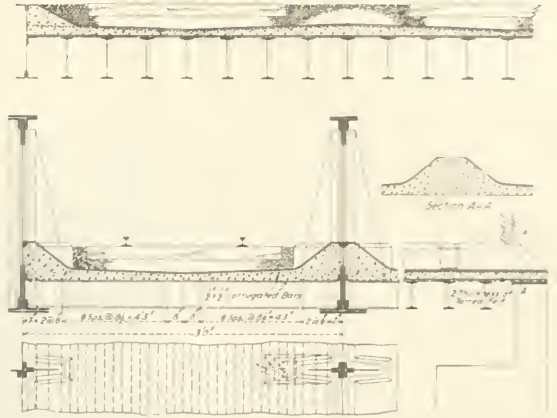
Bridge Floor Details; Chicago Junction Track Elevation.
